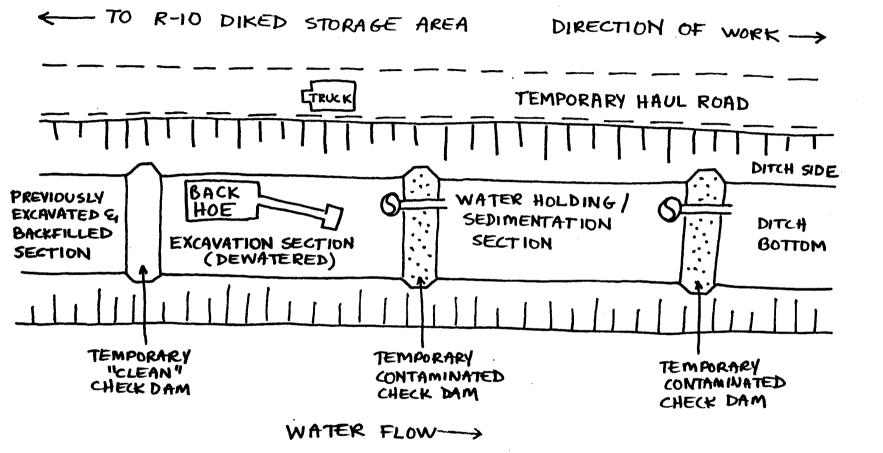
Example of One Method That May Be Used for Ditch Excavation at the Niagara Falls Storage Site (Check Dam/Dewatering System).
